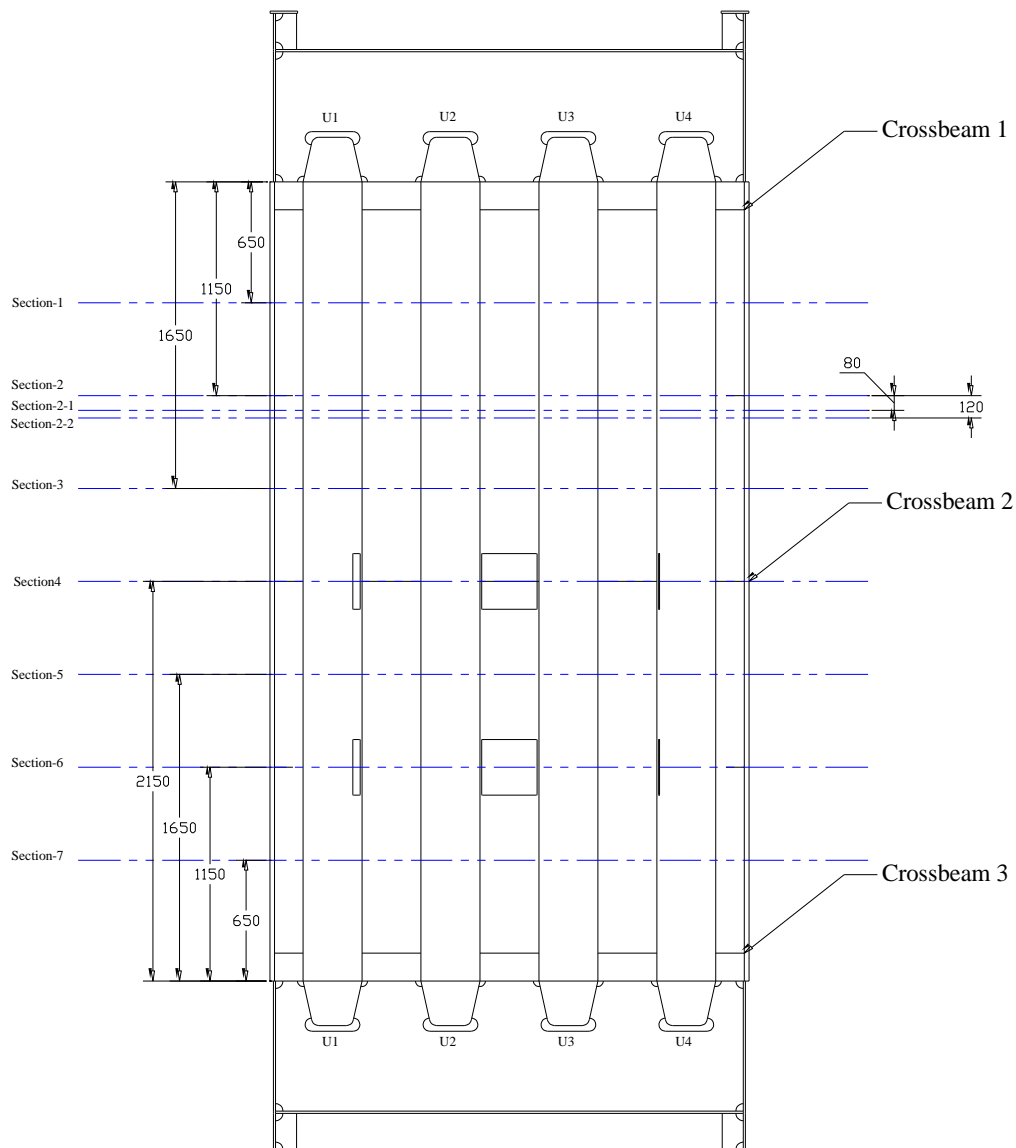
Sketch of orthotropic steel bridge deck specimen(without asphalt surfacing)
